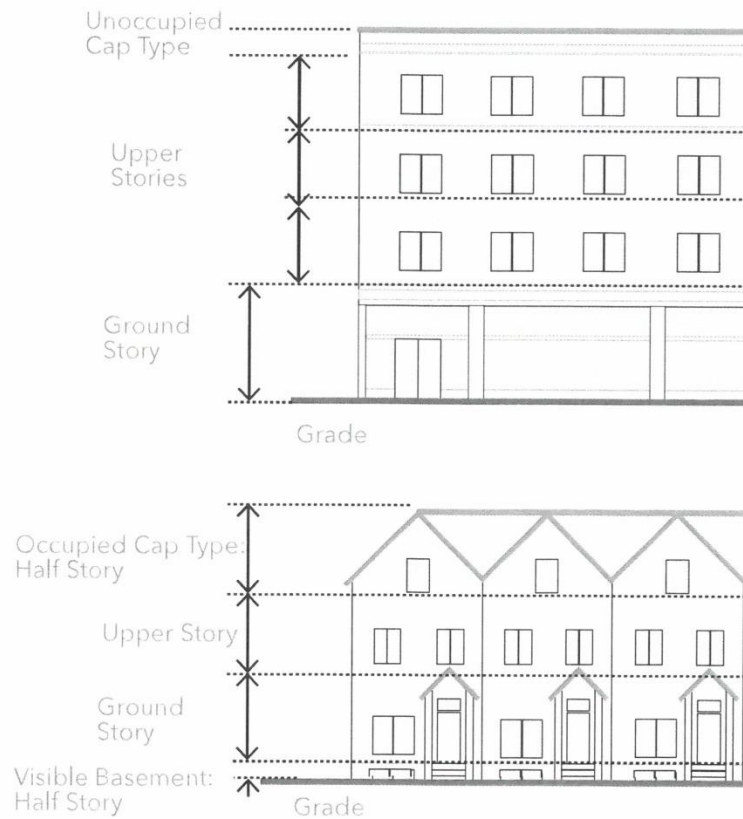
T. Measuring Stories with Floor-to-Floor Height
